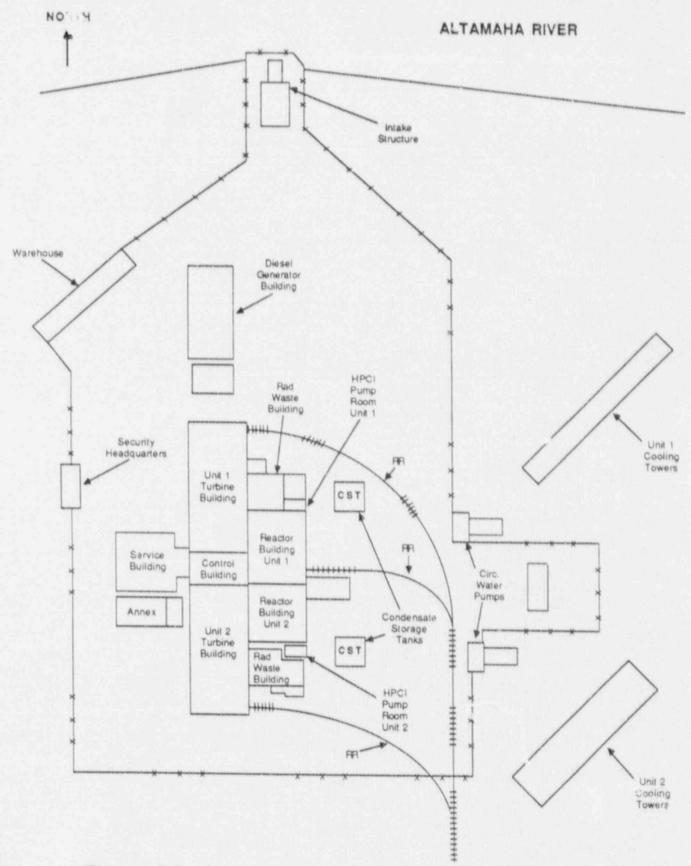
Hatch Units 1 & 2 General Arrangement Plan
